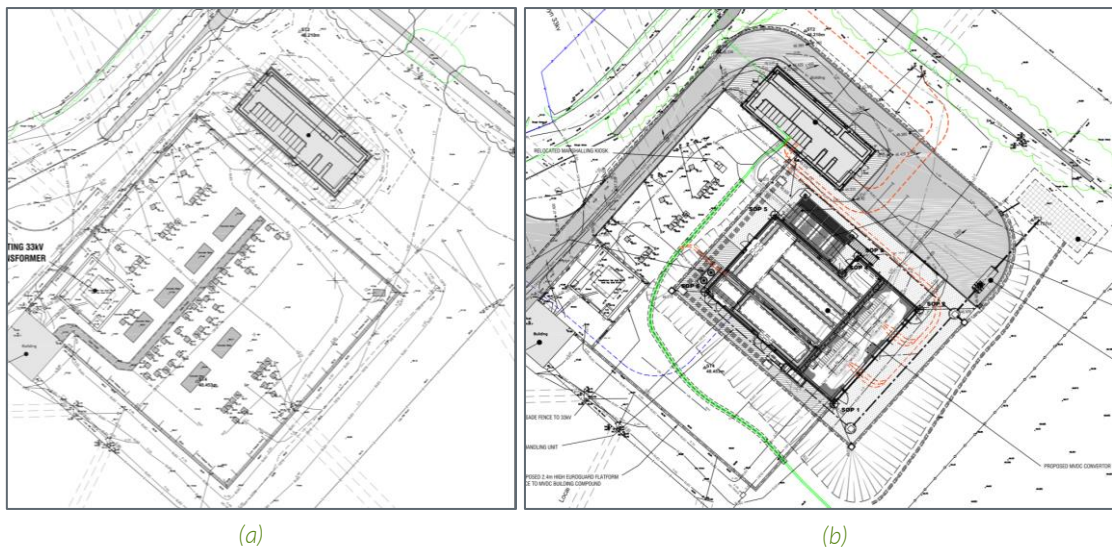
(a) Llanfair PG original site layout. (b) Llanfair PG existing site layout with MVDC converter building showing diverted and newly installed cables.
